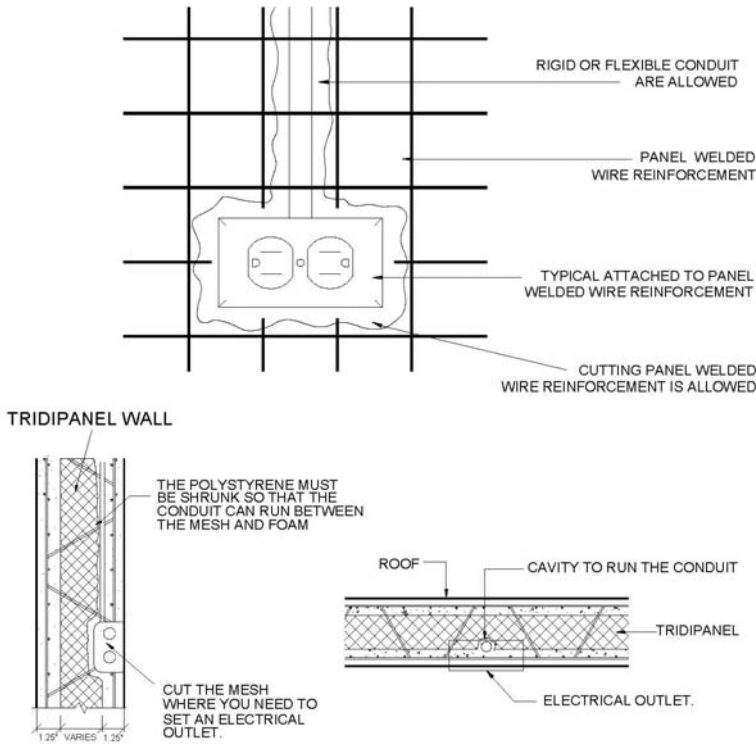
ELECTRICAL INSTALLATION DETAILS
